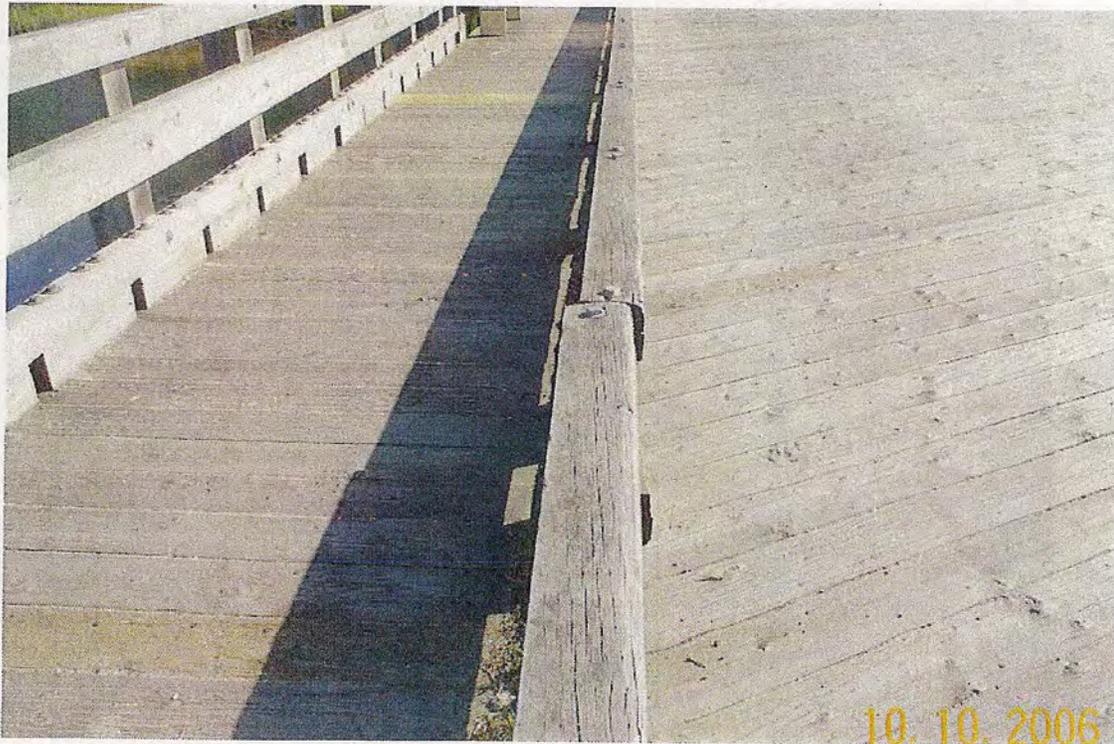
Transverse misalignment of the north curb at the east end of Span 12, looking west.
